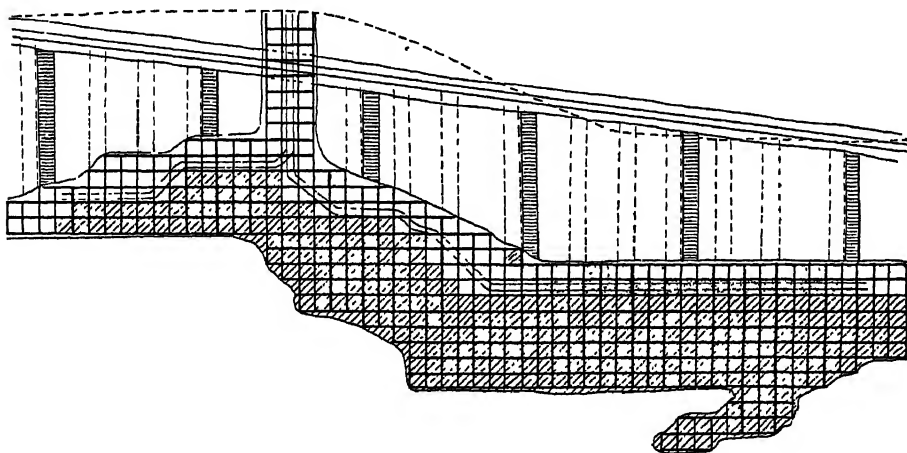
PLAN OF TOP FLOOR OF STOPE, SHOWING WASTE DISTRIBUTION.
